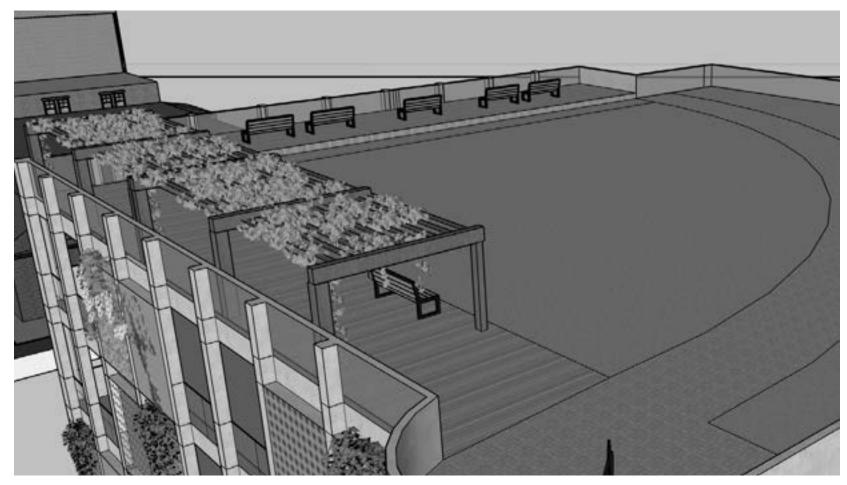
New public viewpoint, plaza, and greenspace located on the top floor of Commercial Street Garage.
